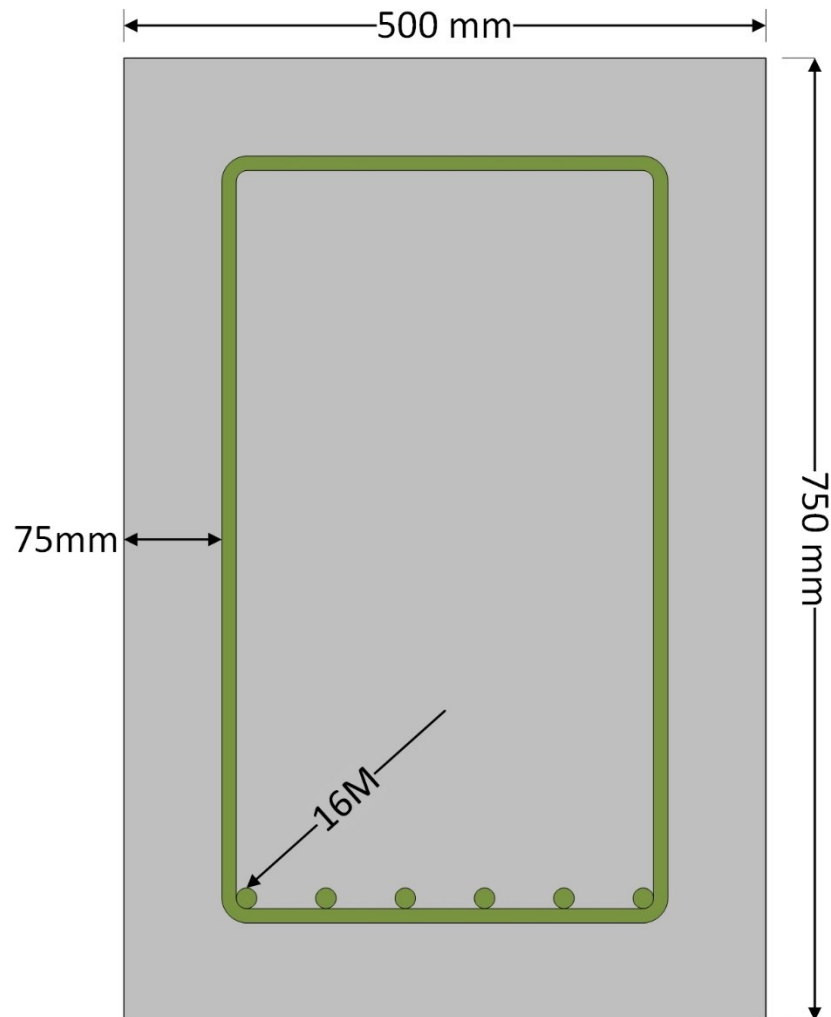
Over-Reinforced Beam Cross Section using 16 mm GFRP rebar
